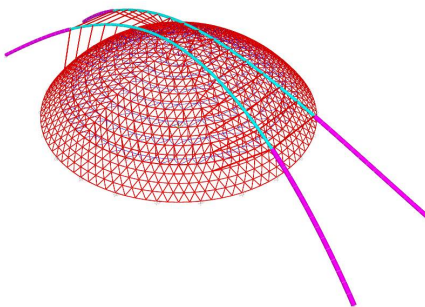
arrangement plan of Suspendome with Stacked Arch
